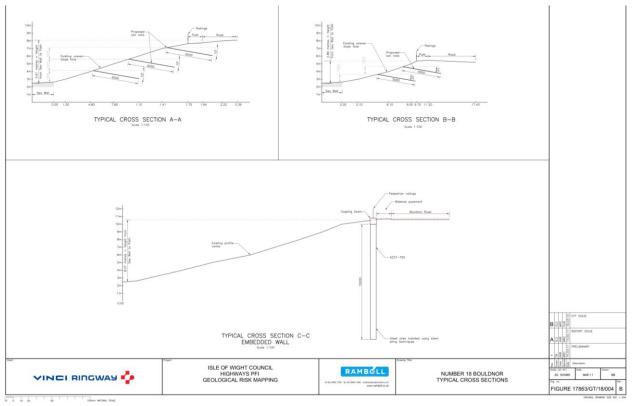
Proposed engineering solution at Bouldnor Road, Yarmouth
